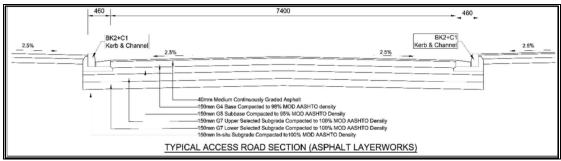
Proposed Road Layerworks: Asphalt- 640 mm total thickness (source: Walters, 2020)
